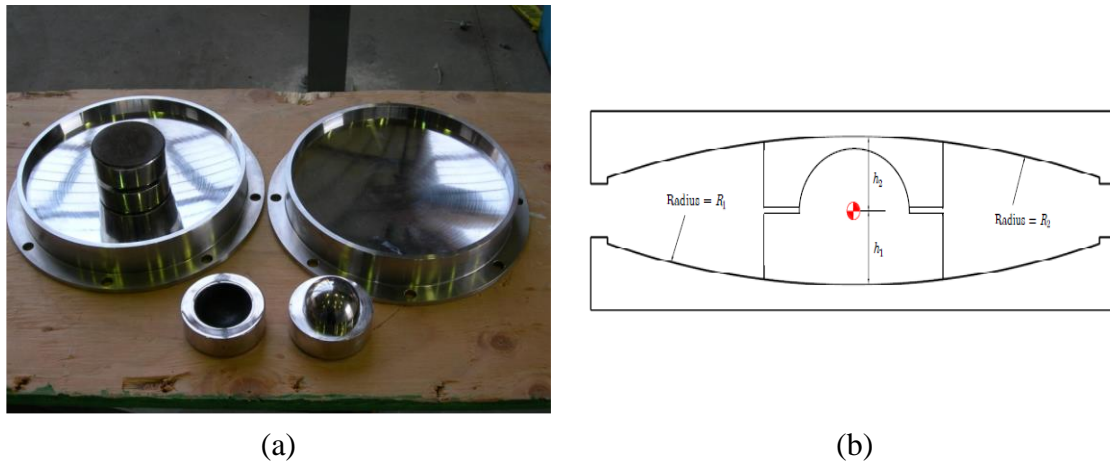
Double pendulum bearing (a) Disassembled and (b) section view (Morgan and Mahin, 2011)
